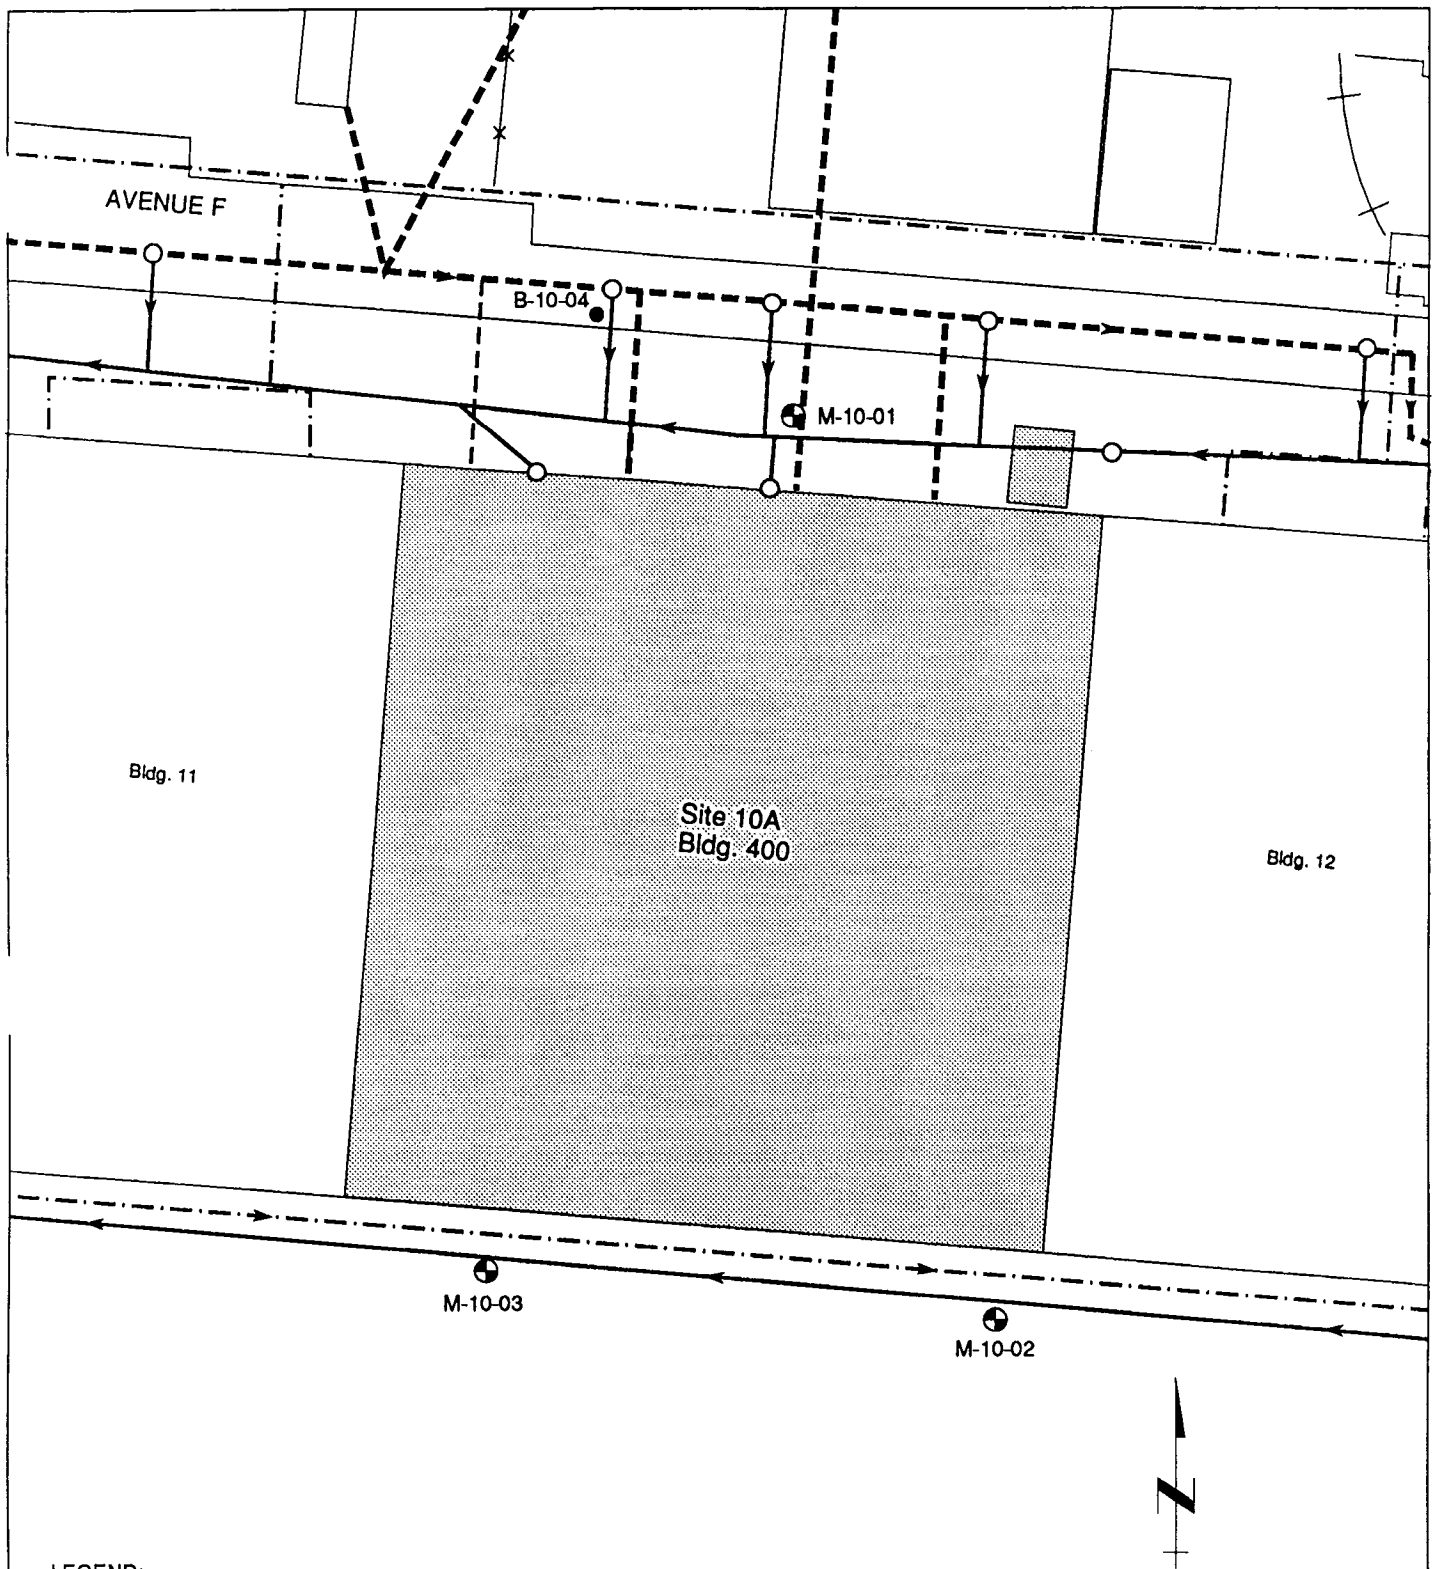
shows the site layout and the configuration of the storm, sanitary, and industrial sewer lines around Site 10A. Four industrial sewer lines leave the northern side of Building 400 and join the main line running under Avenue F. The sanitary sewer line runs from the southern side of the building and immediately joins the main running east. Storm sewer lines connect the building downspouts to mains under Avenue F and the aircraft parking apron south of the building.
